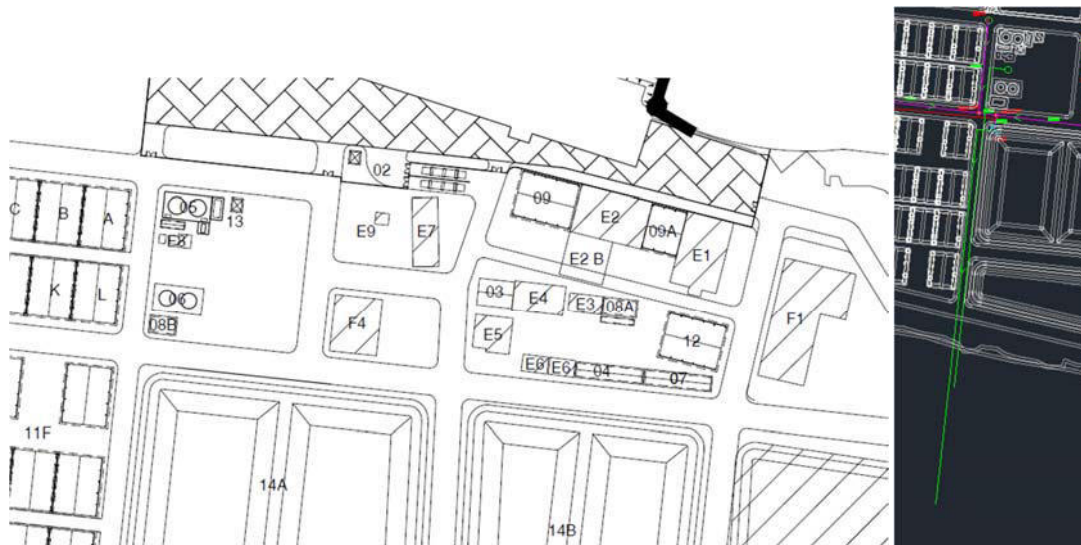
Location of utility building and brine out fall. Existing utility building is marked as E3. New borehole will be established adjacent to the proposed desalination building (image on right). Water storage tanks are to be established at building no. 06 and fuel and waste oil storage tanks at building no. 05. Building no. 08A is the proposed powerhouse and 08B desalination building.
